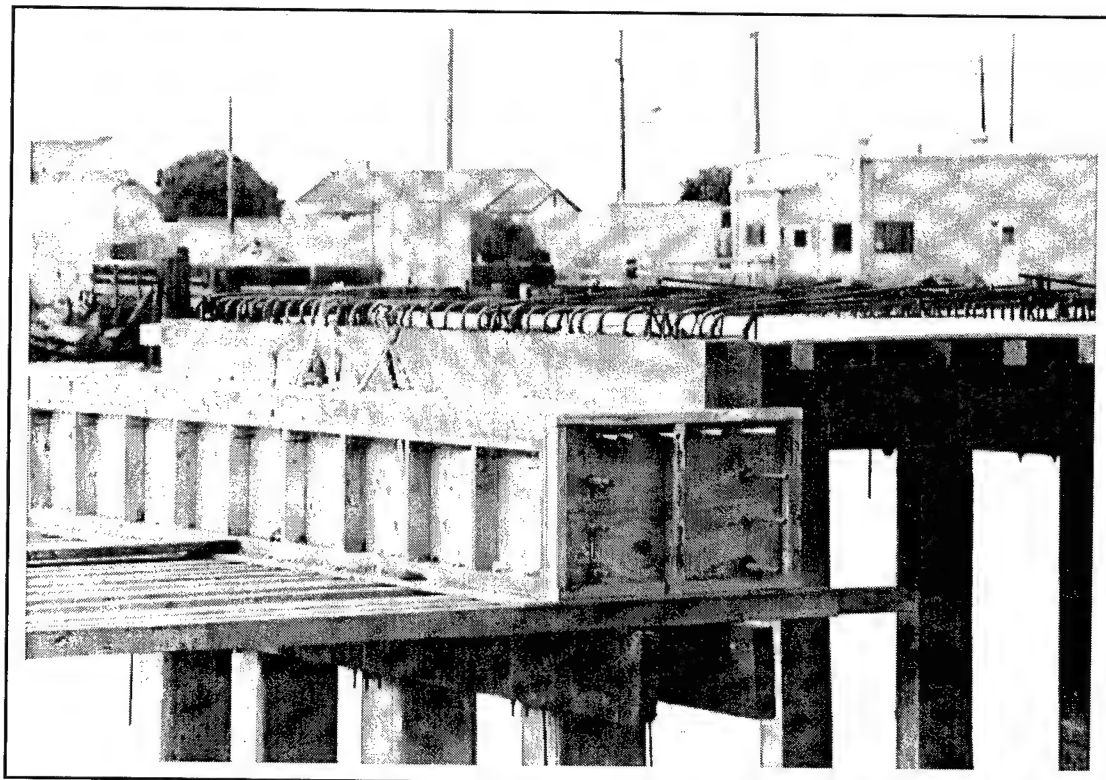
Ducts projecting outside the formwork and PVC tubes extending above the finished concrete surface.
